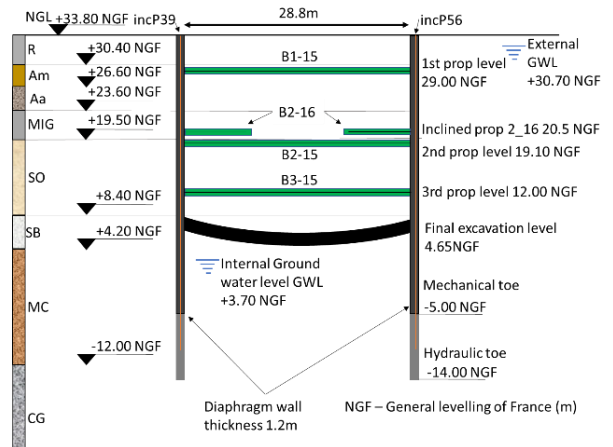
Les Ardoines Western Pit cross section between inclinometers incP39 and incP56
